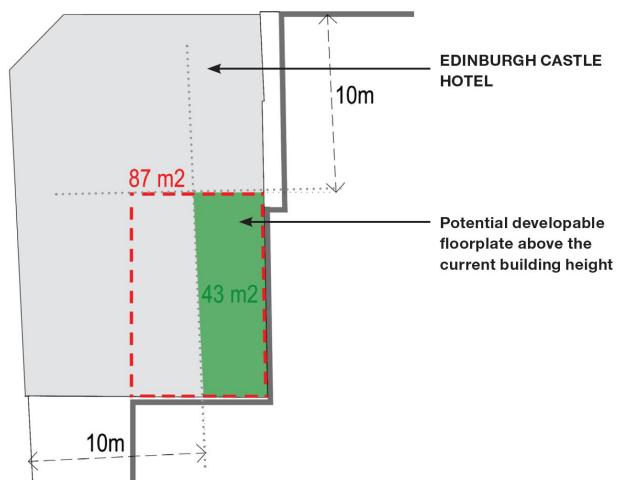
Potential setbacks and floor plan of development above the Edinburgh Castle Hotel
